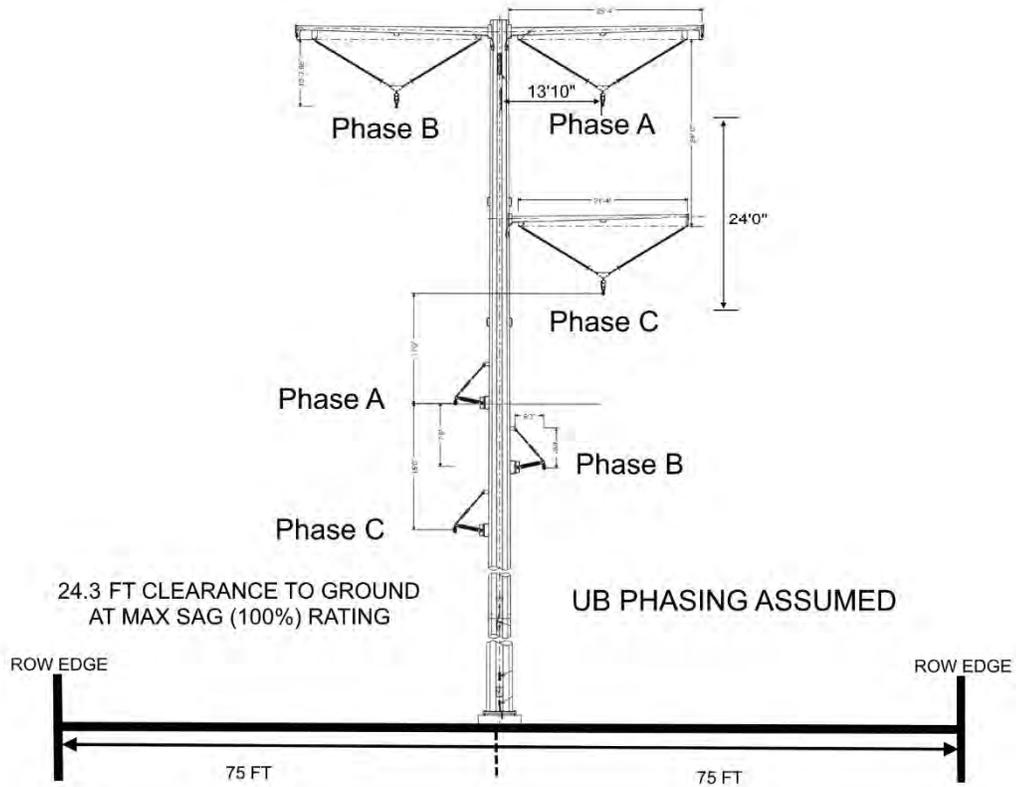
Wilmarth – West Faribault Circuit with 69 kV Underbuild
